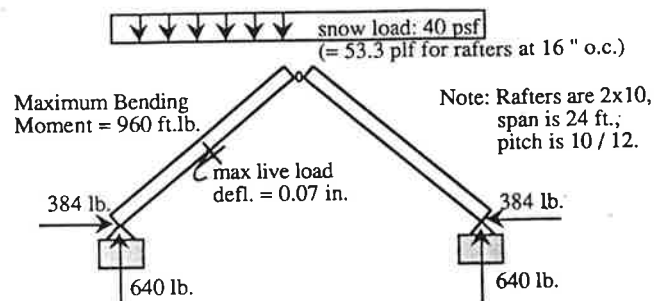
Two rafters, configuration 1, supported horizontally and vertically at top of wall.
